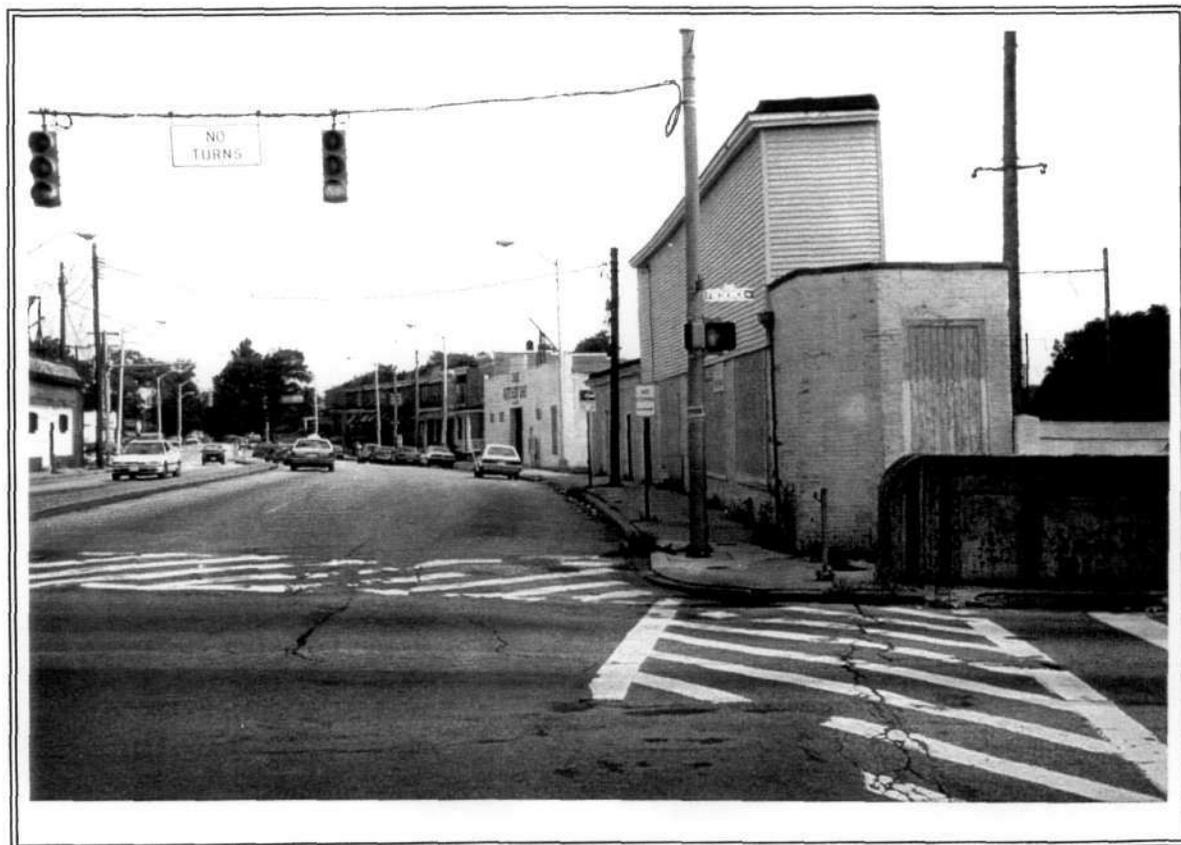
View from the southwest corner of the bridge, looking northwest (#6)
